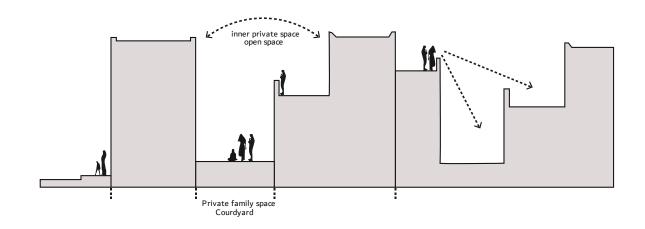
A section through adjoining houses showing how setbacks are used to maintain privacy between neighbours (S.Bahammam 2006)
